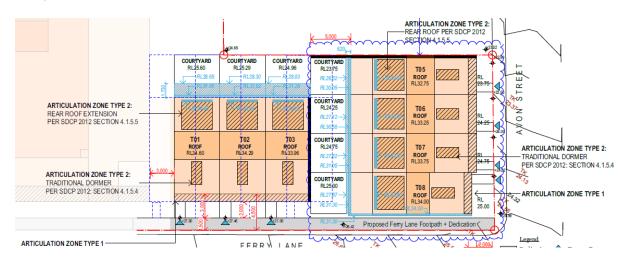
Proposed envelope detail: terraces (blue areas indicate articulation zone)
